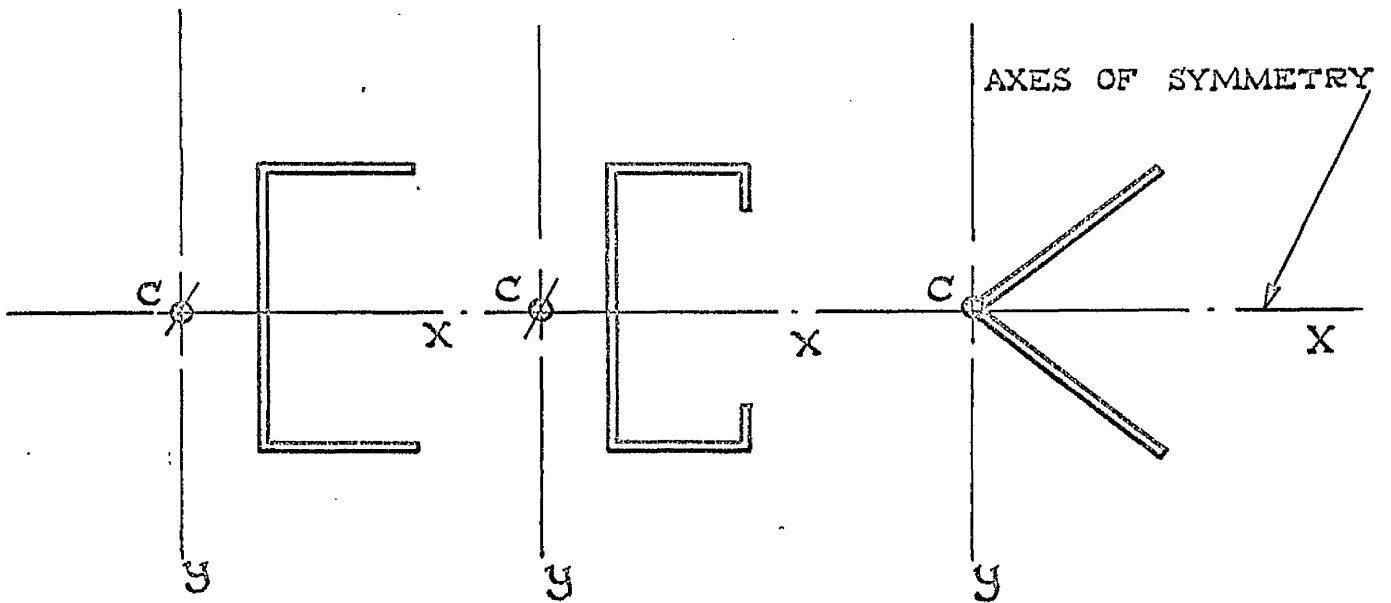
MONOSYMMETRICAL THIN - WALLED OPEN SECTION BEAMS.
